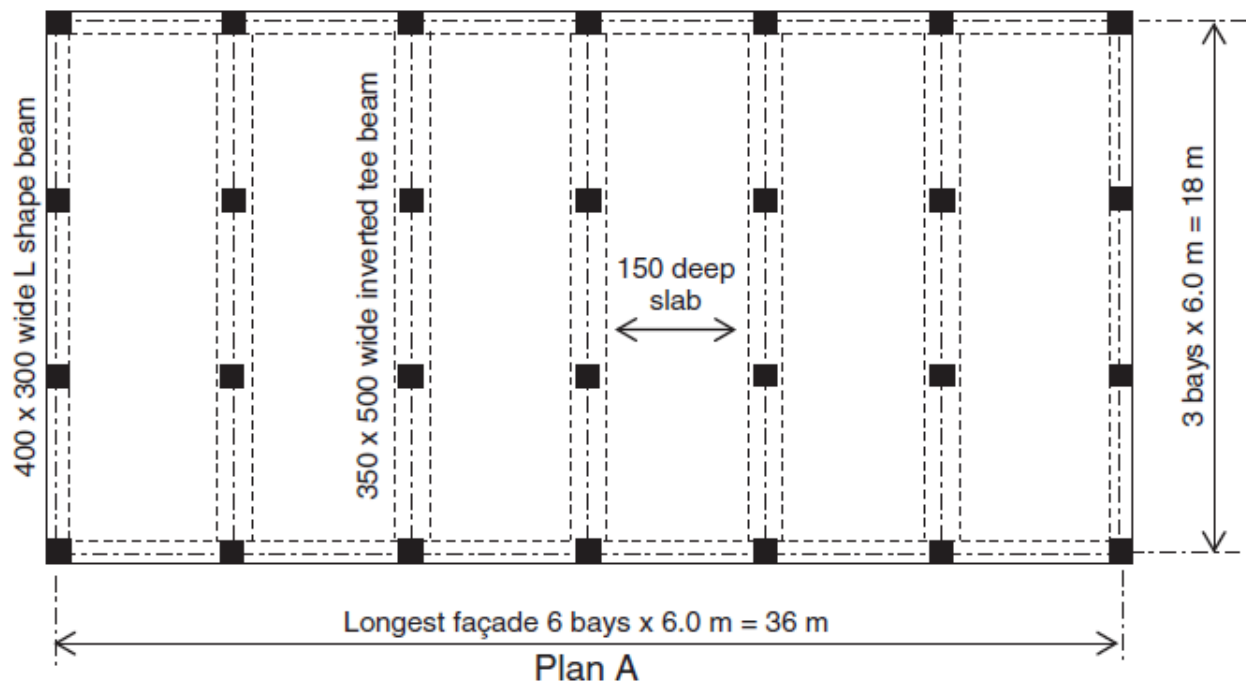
Alternative floor plans based on the orientation rule of floor and beam span directions.
